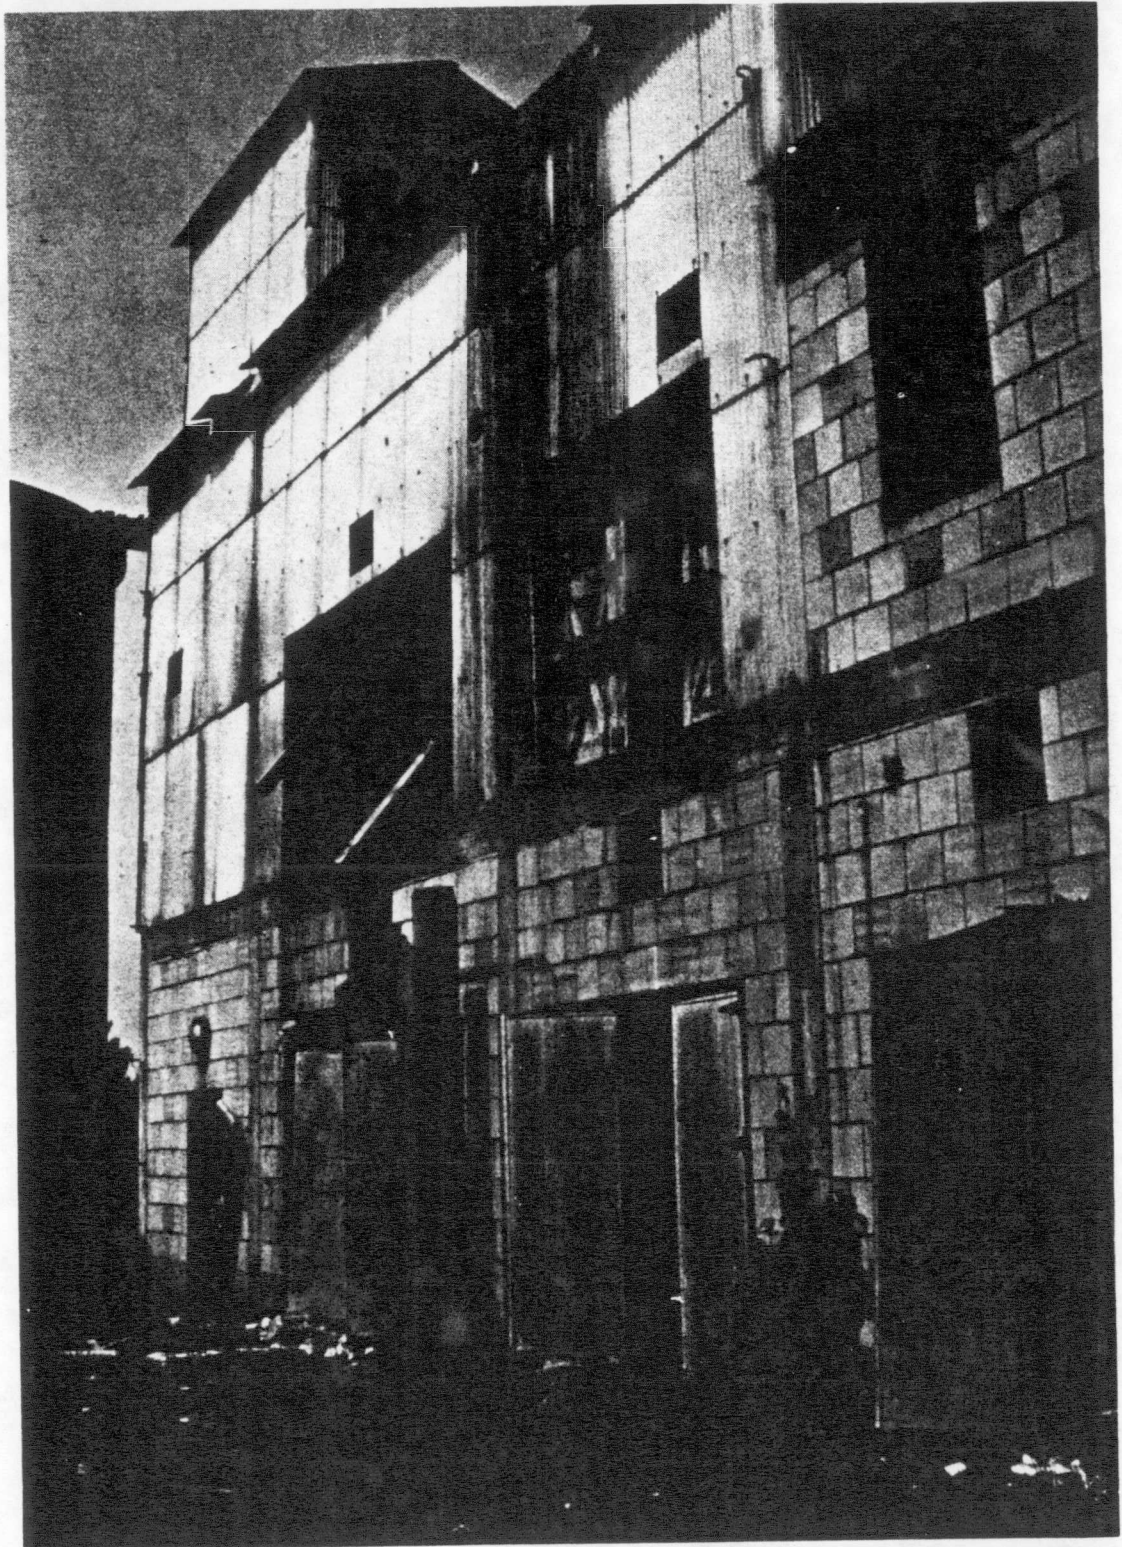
ARSENIC TRICHLORIDE MANUFACTURING BUILDING, JUNE 1977
